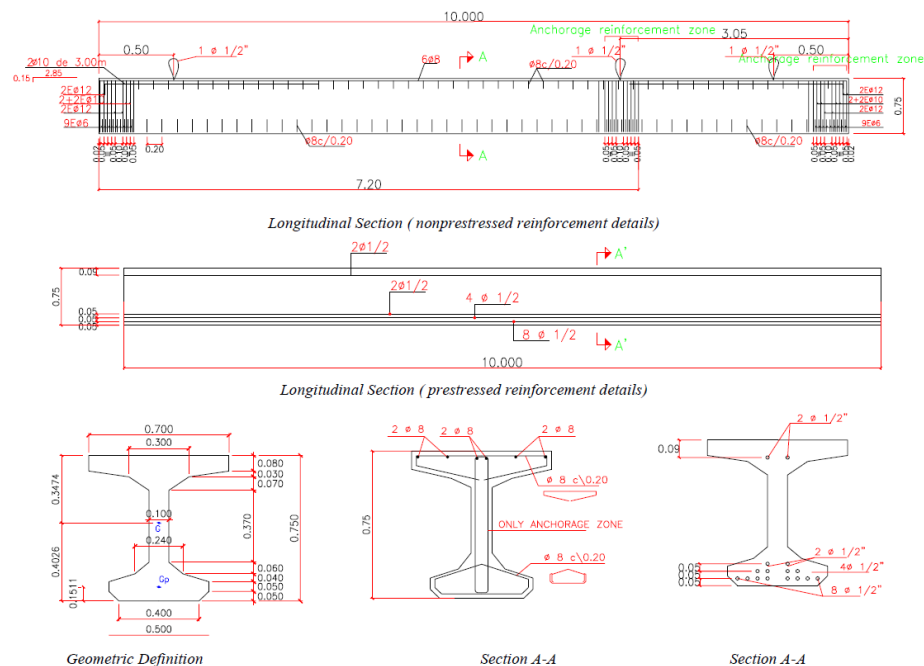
Case PB5. Geometry, reinforcement layout and the location of the prestressing strands (dimensions in m). The pictures are taken from (Choulli, 2005).
